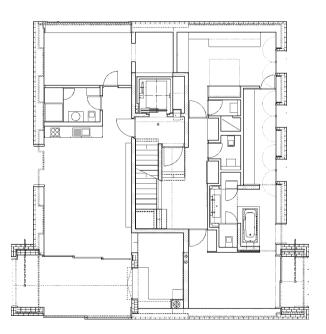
Plan of 1st floor The living room extends from one facade to the other.
